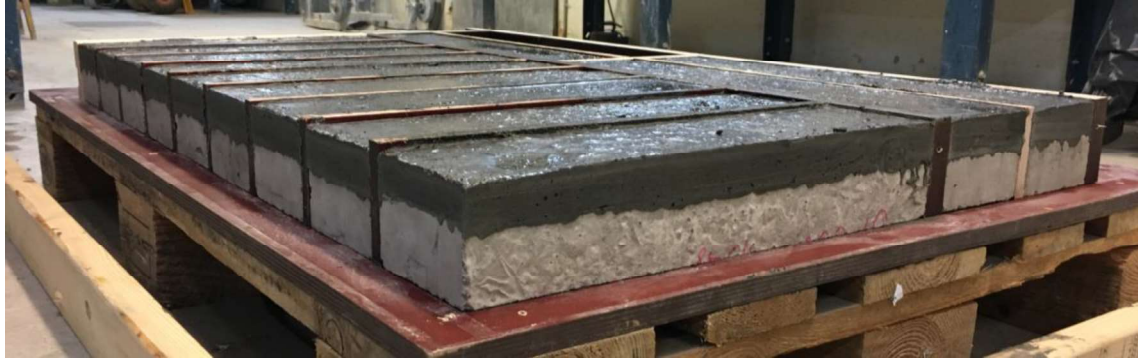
Demolded UHPC overlay specimens (prom picture 3-10)
